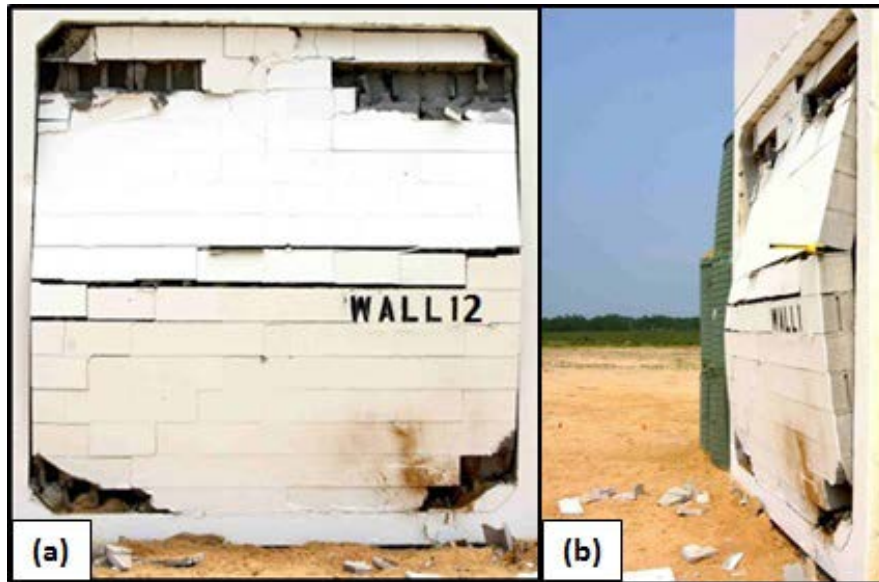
FS12. (a) Posttest exterior view. (b) Final location of CMU wall.
